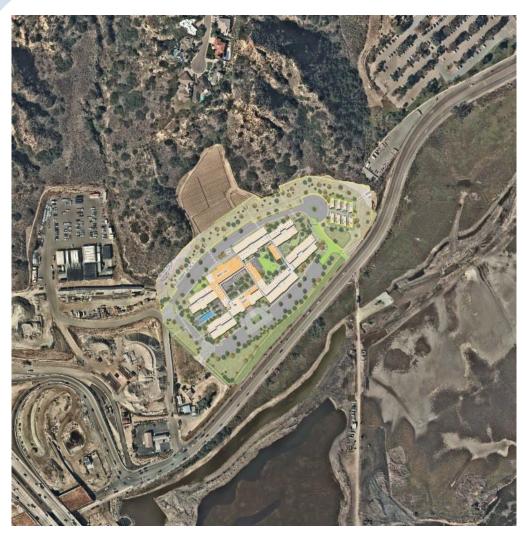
AERIAL WITH PROPOSED SITE PLAN
